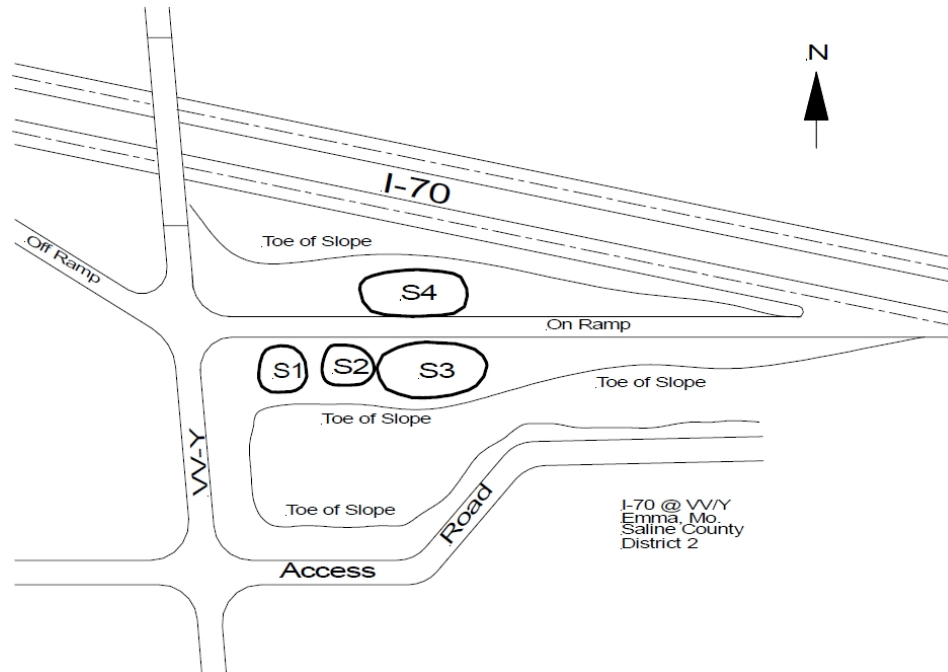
Plan view of I-70 Emma field recurring surficial failures (from Parra et al. 2003)
